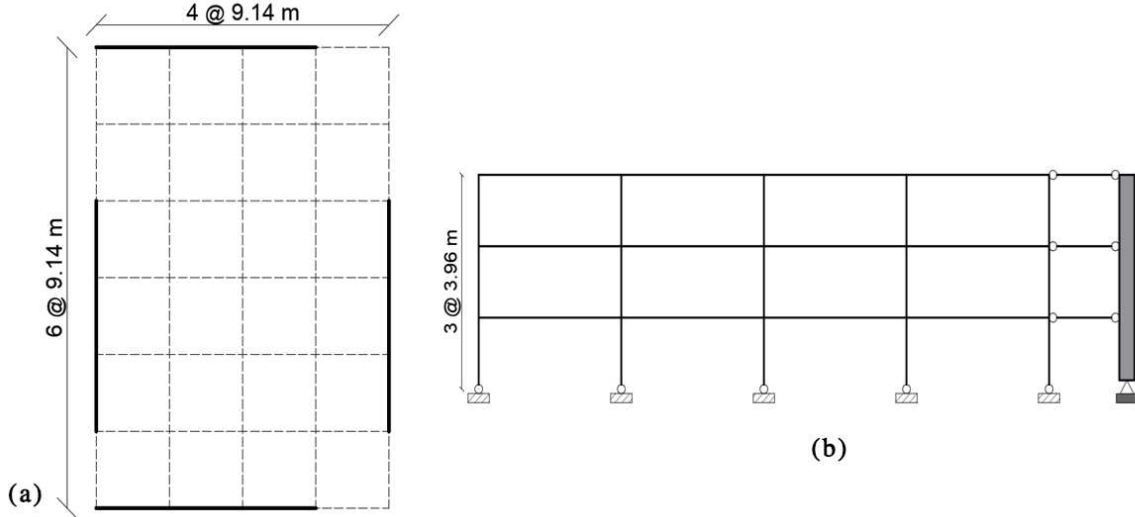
(a) Plan view and (b) elevation view of the 3-story structure [28]
